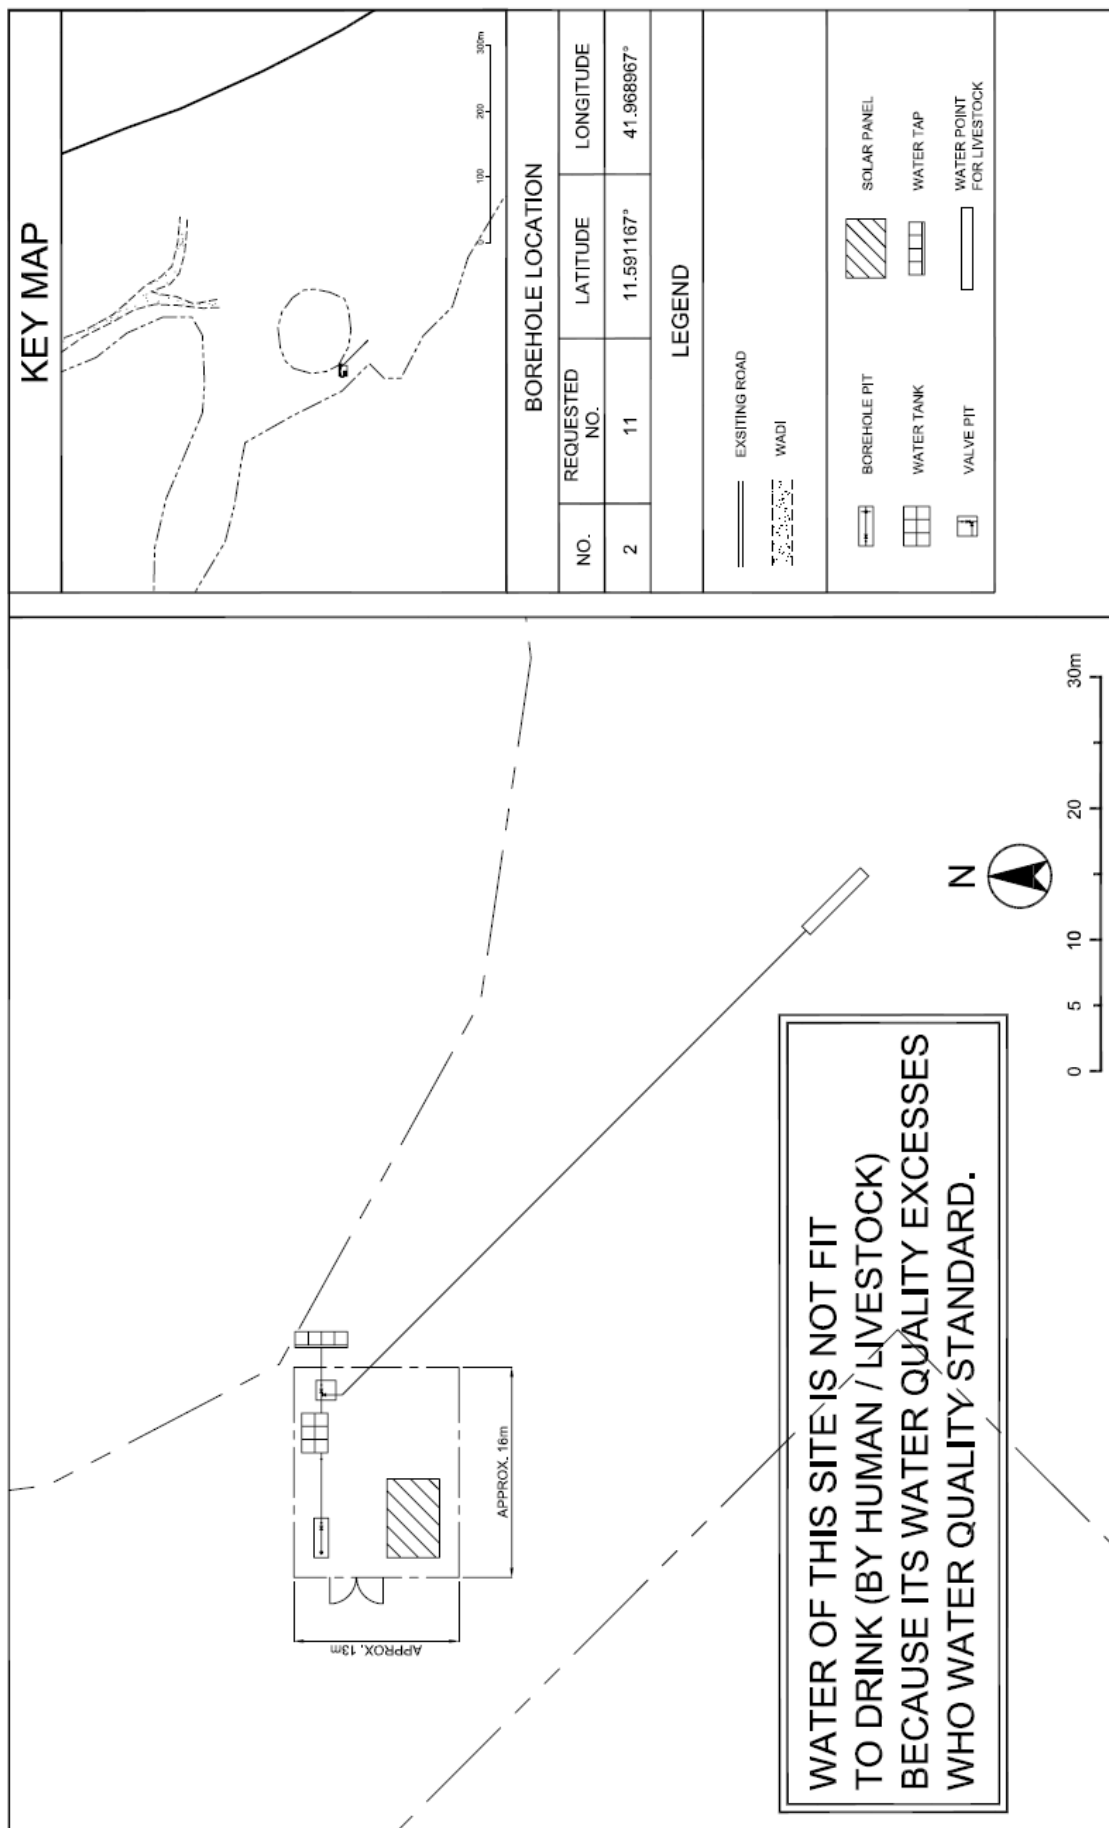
Layout of Facility (3) [Daguiro (2)]
